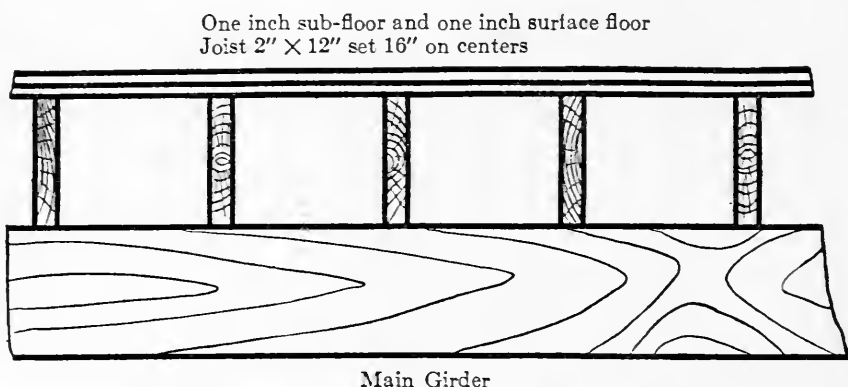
UNDESIRABLE FLOOR CONSTRUCTION¹
